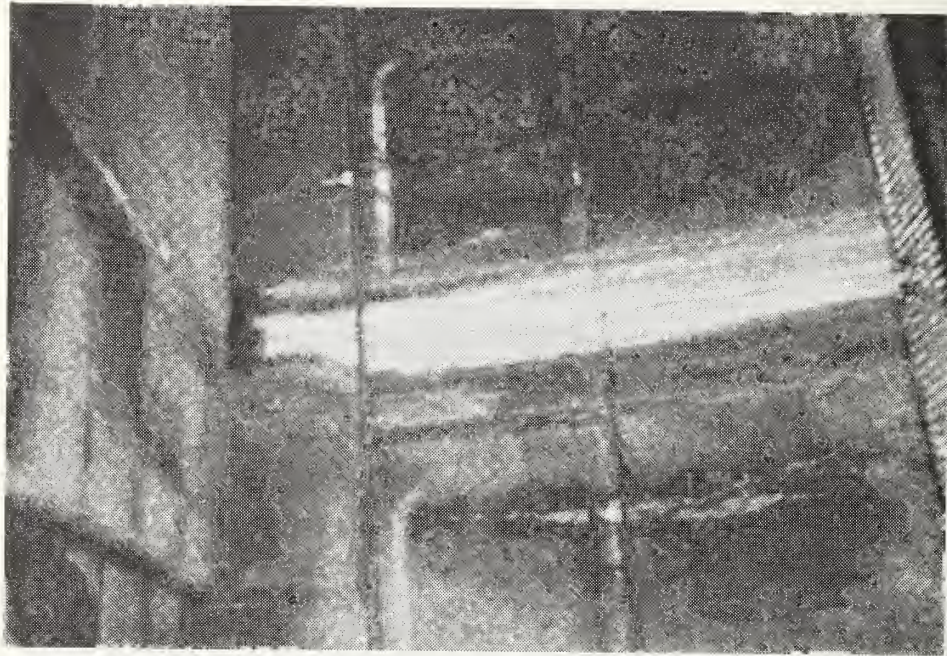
STONE WALLS DAMAGED BY WATER INTRUSION
